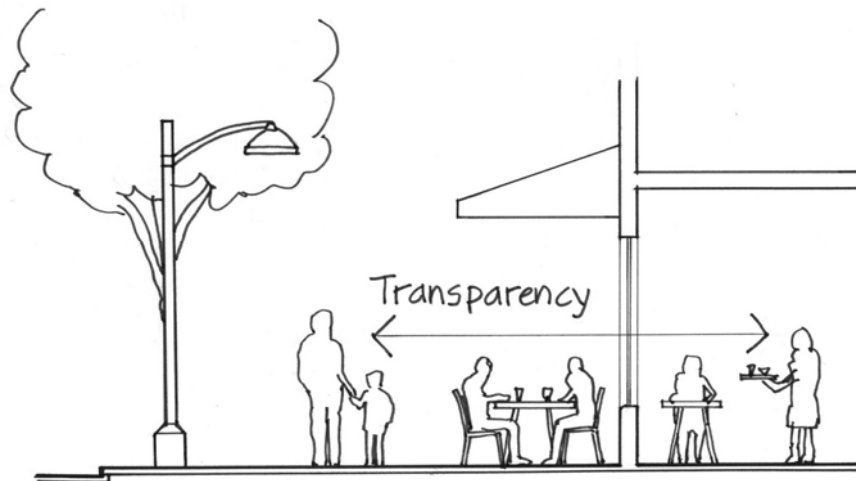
Active, transparent ground floor facades for commercial buildings, with visibility into interiors from the park and/or adjacent streets
